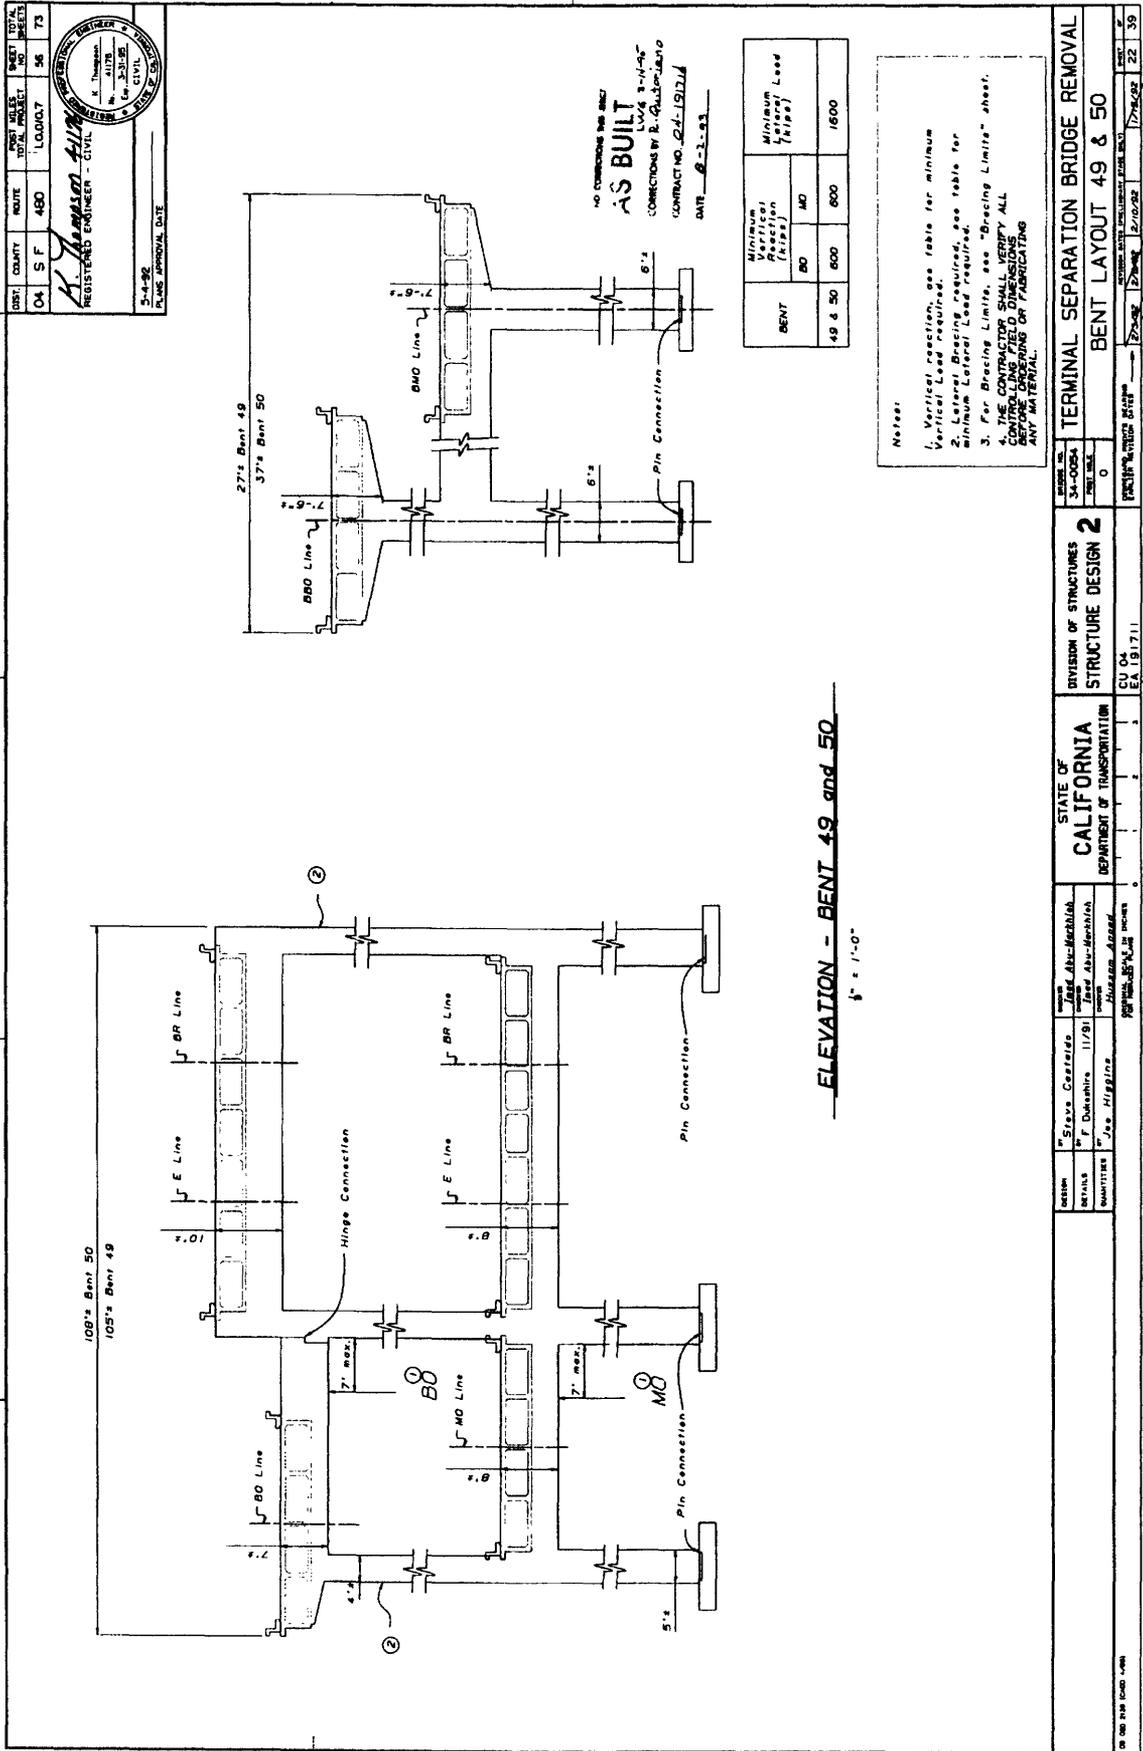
Elevation drawing of Bent 49 and 50 at Terminal Separation.
